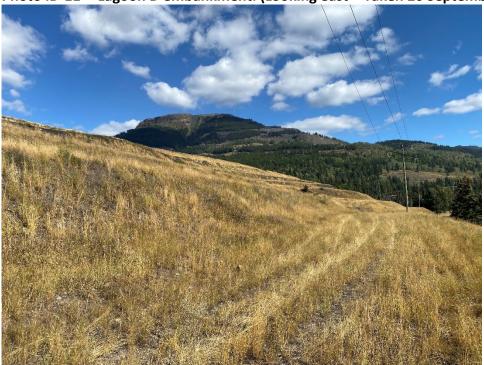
Lagoon D embankment. (Looking north – Taken 20 September 2022)
